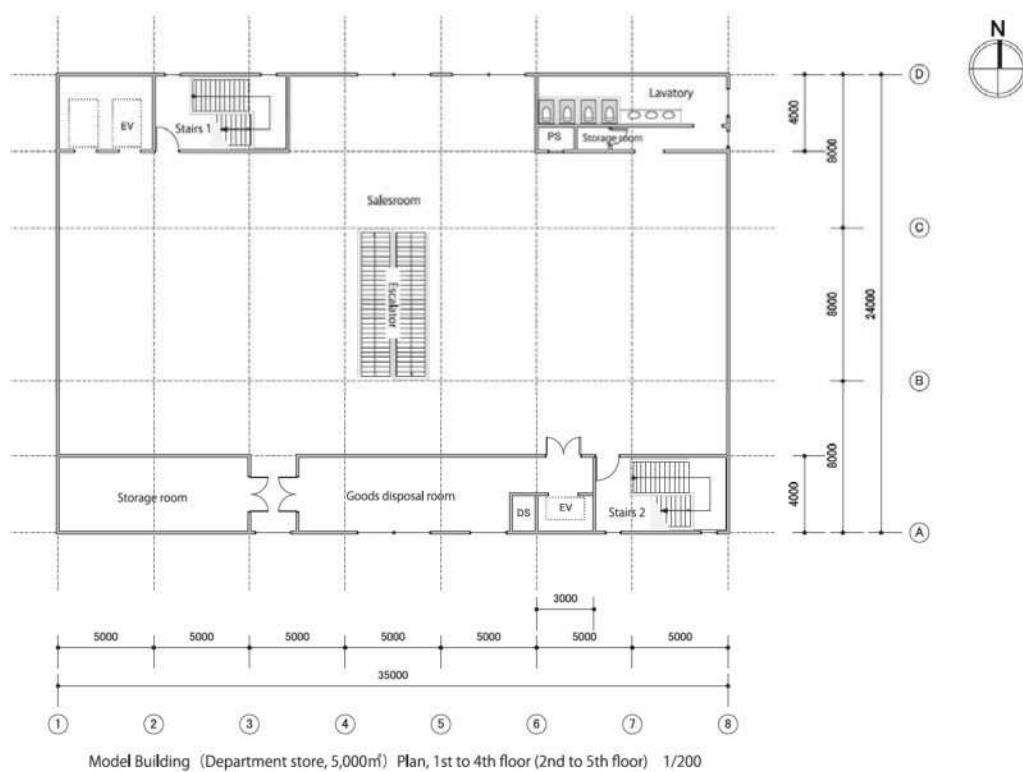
Model building (department store, 5 000 m²) plan, 1st to 4th floor (2nd to 5th floor) 1/200
